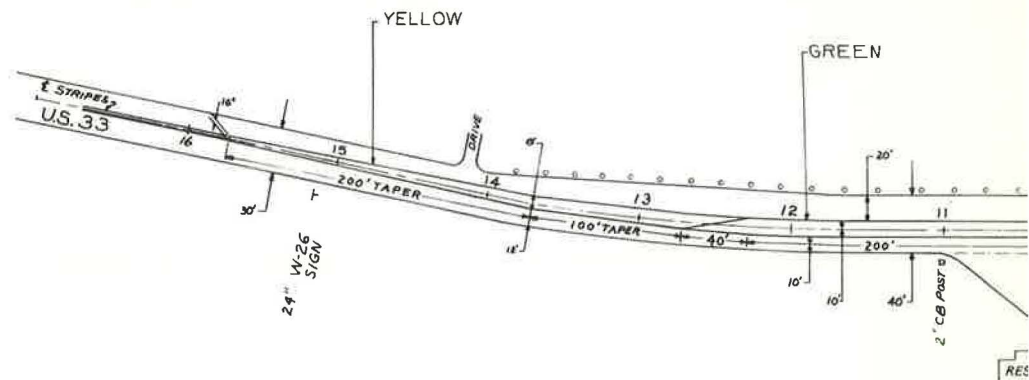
The intersection of US 33 and Hayden Run Road showing details of colored asphalt.
